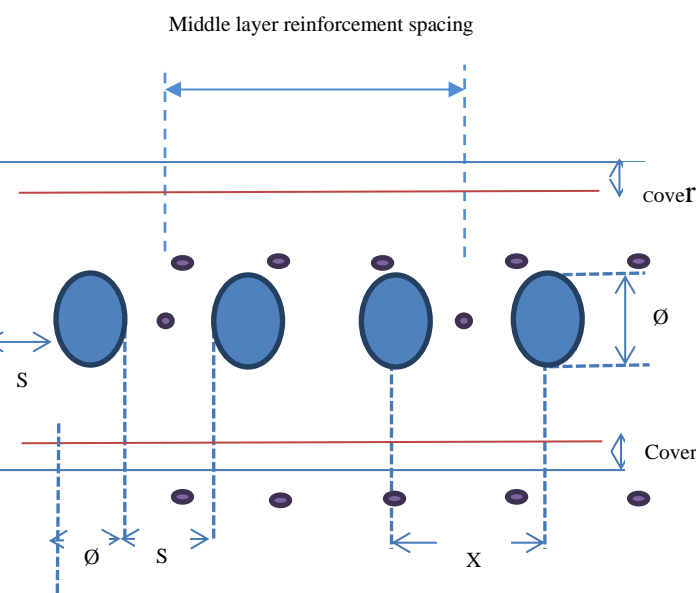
Typical cross section of slab with top, bottom and middle layer reinforcement placed in between balls for all bubble deck slabs
